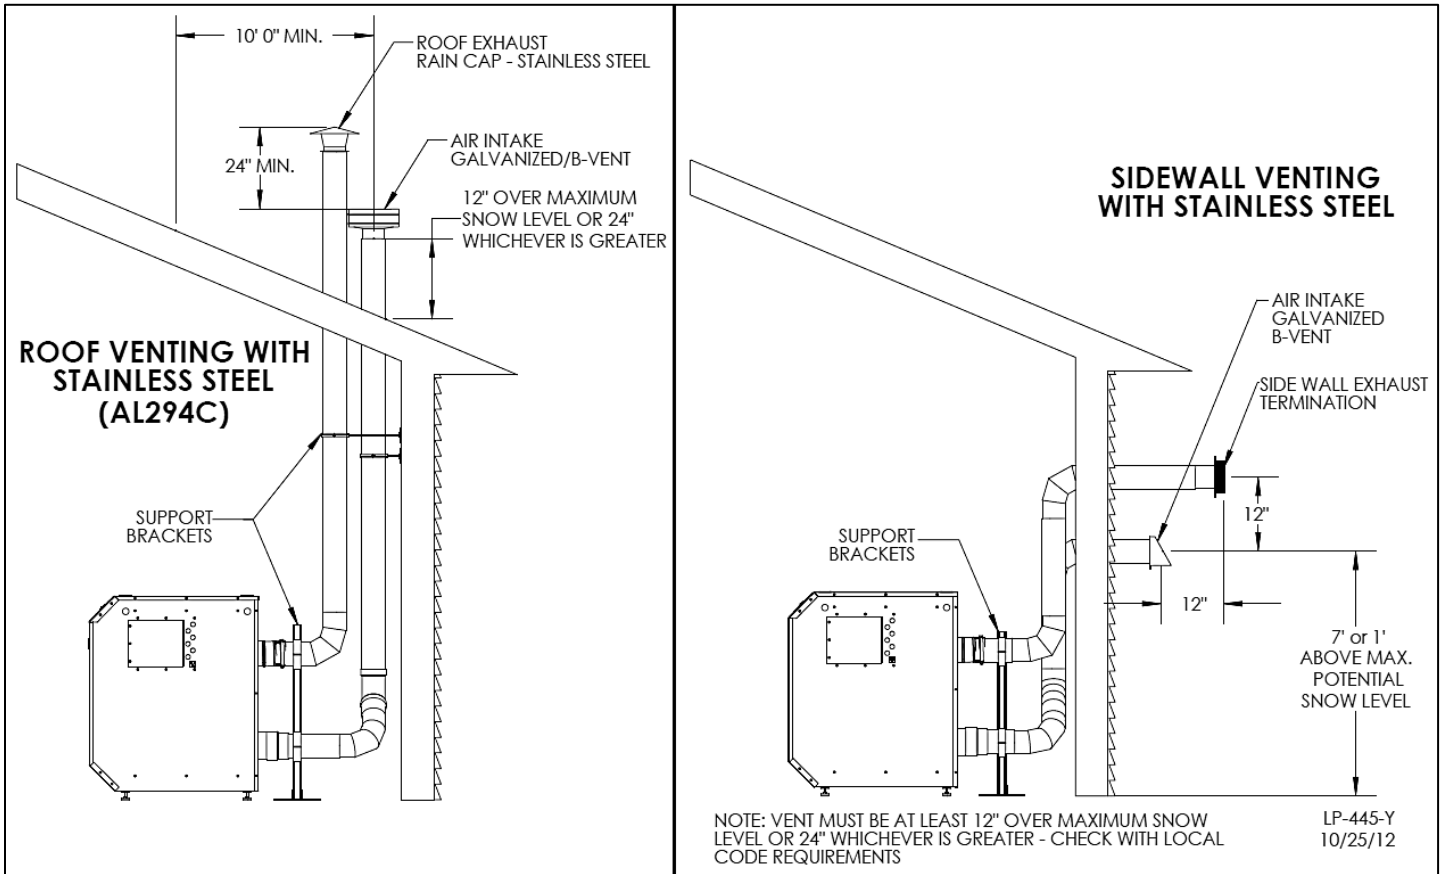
Roof and Sidewall Venting with Stainless Steel
